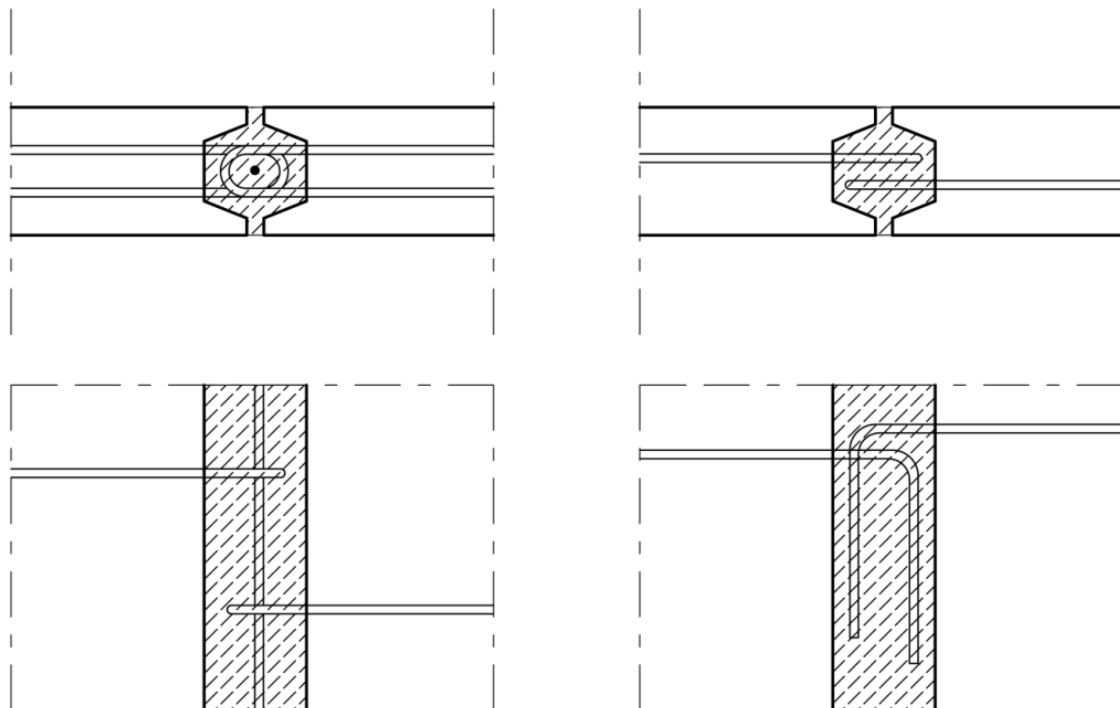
A steel loop connection (left) and a steel hook connection (right). (Redrawn from BES-suositus, 1972).
